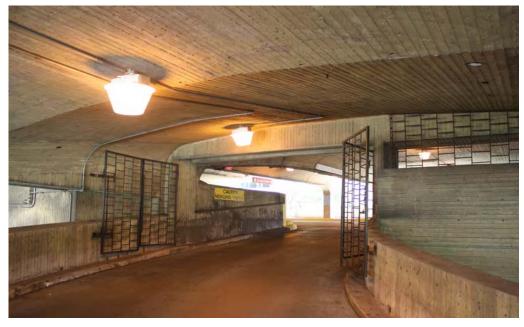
Interior view of ramp at south exit toward Frontage Road, camera facing south.
